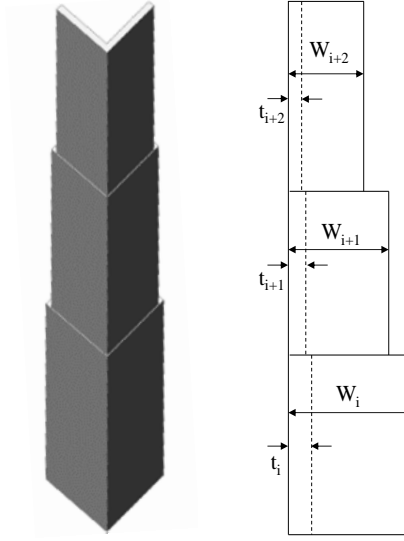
The geometric requirements on steel sections of the leg members in a tower.
